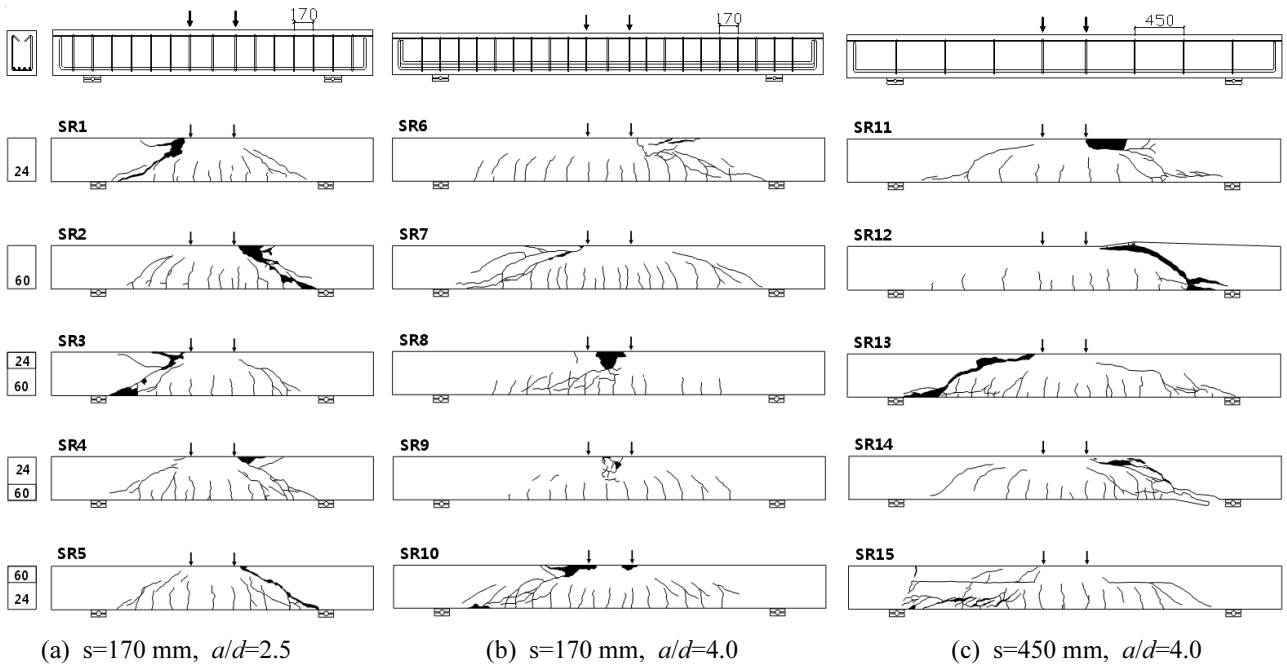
Crack pattern of SR1~SR15 at the end of test
